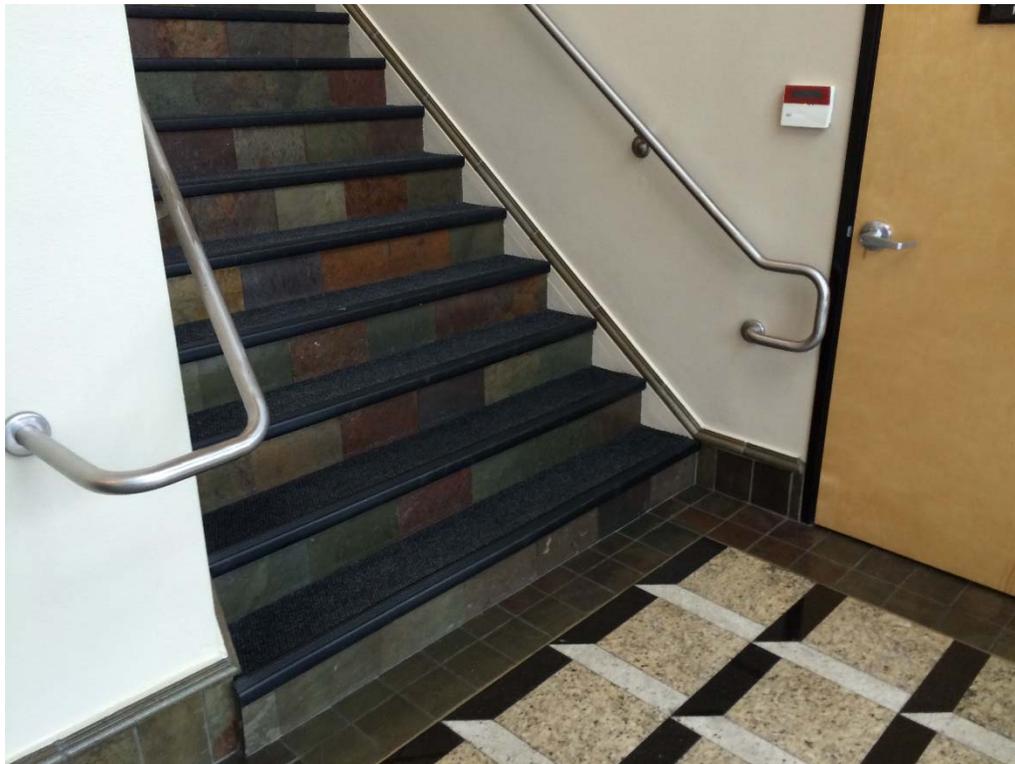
Stairs are steeper than code required, exceeding 7 inches at risers
